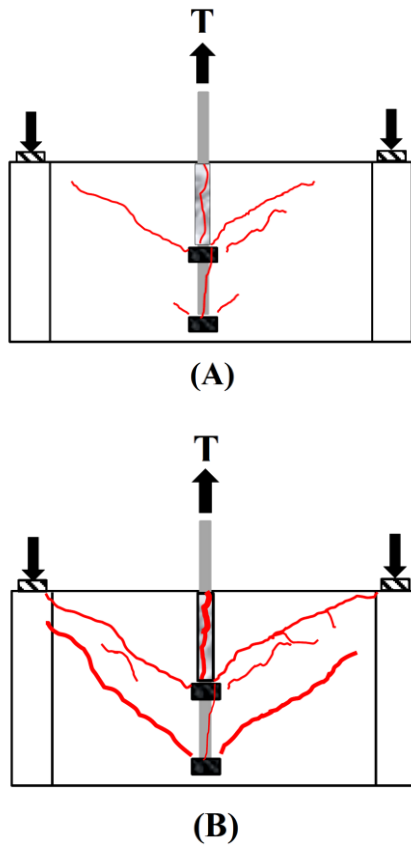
Cracks Propagation in Dual Headed Bar Specimens in Pullout Tests (A) Initial Cracks (B) Cracking at Failure.
